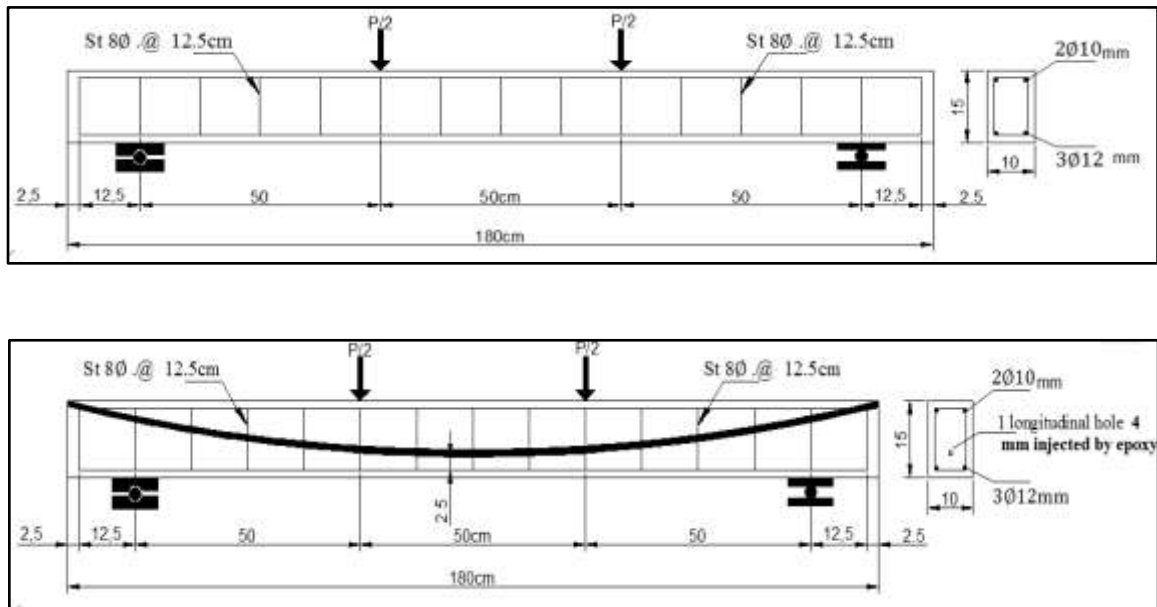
Reinforcement Details for Control Beam and Beam with Internally Injected by Epoxy
